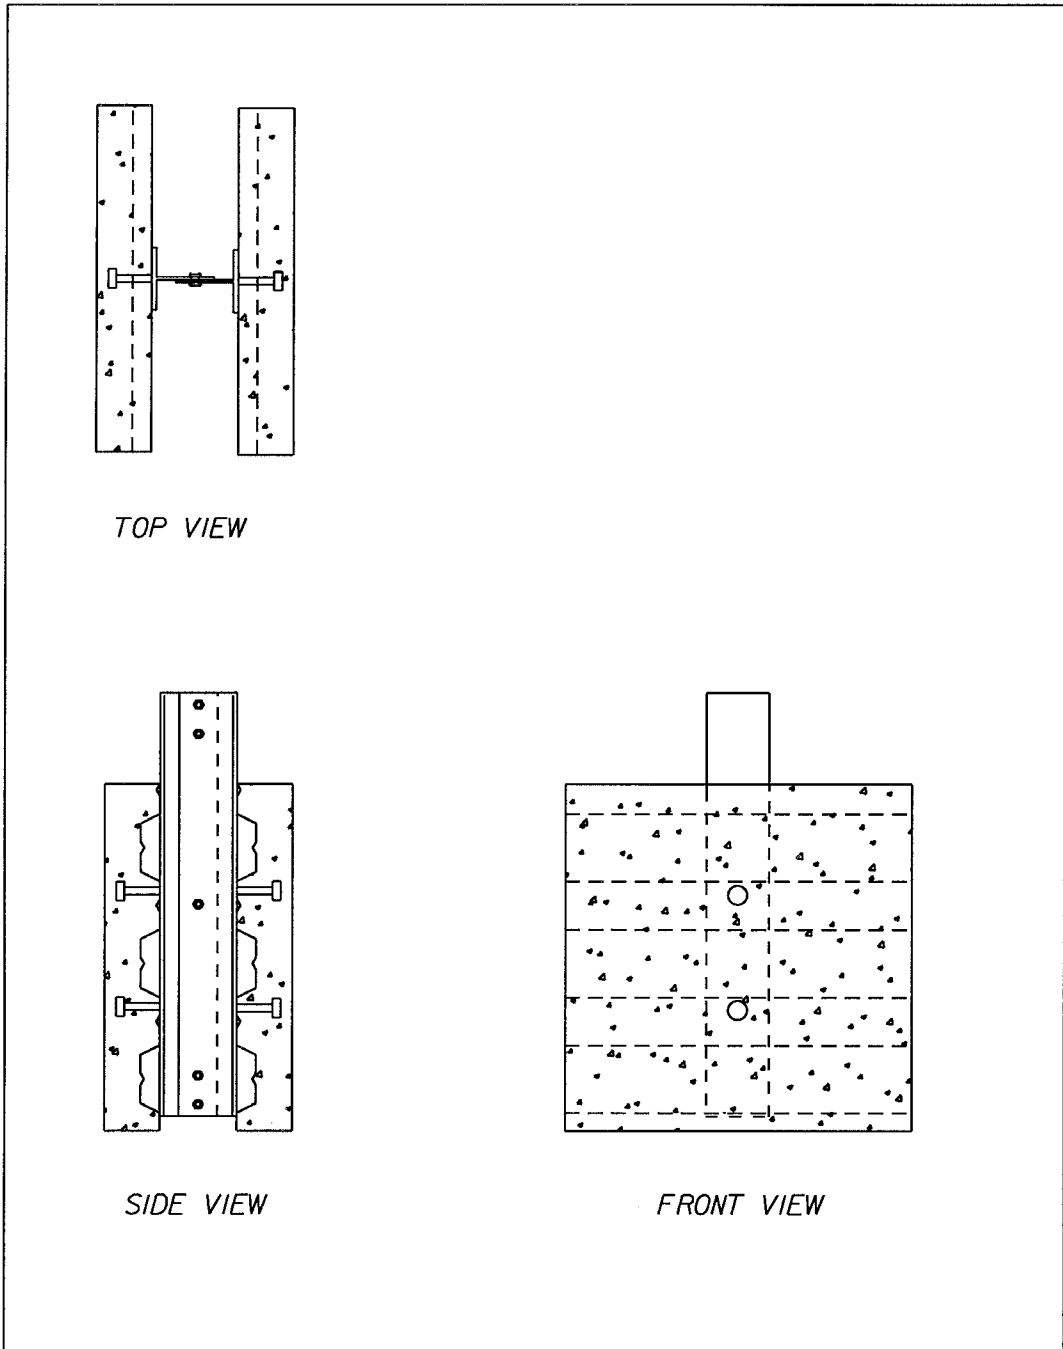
Composite Slab Push-Out Specimen with Studs in the "Strong" Position (Welded Wire Fabric not shown)
